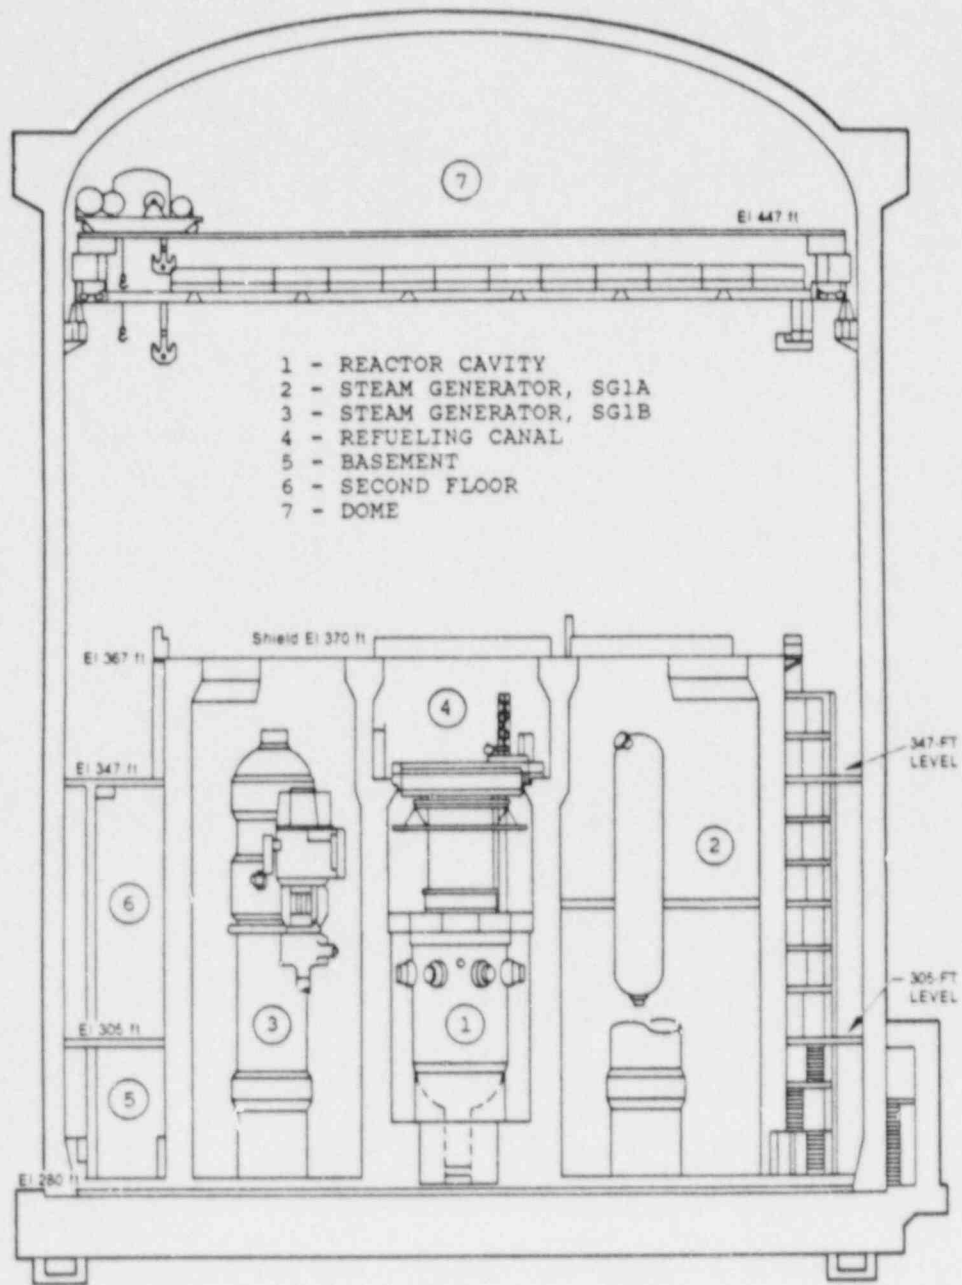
TMI-2 Containment Vertical Cross Section Cut
